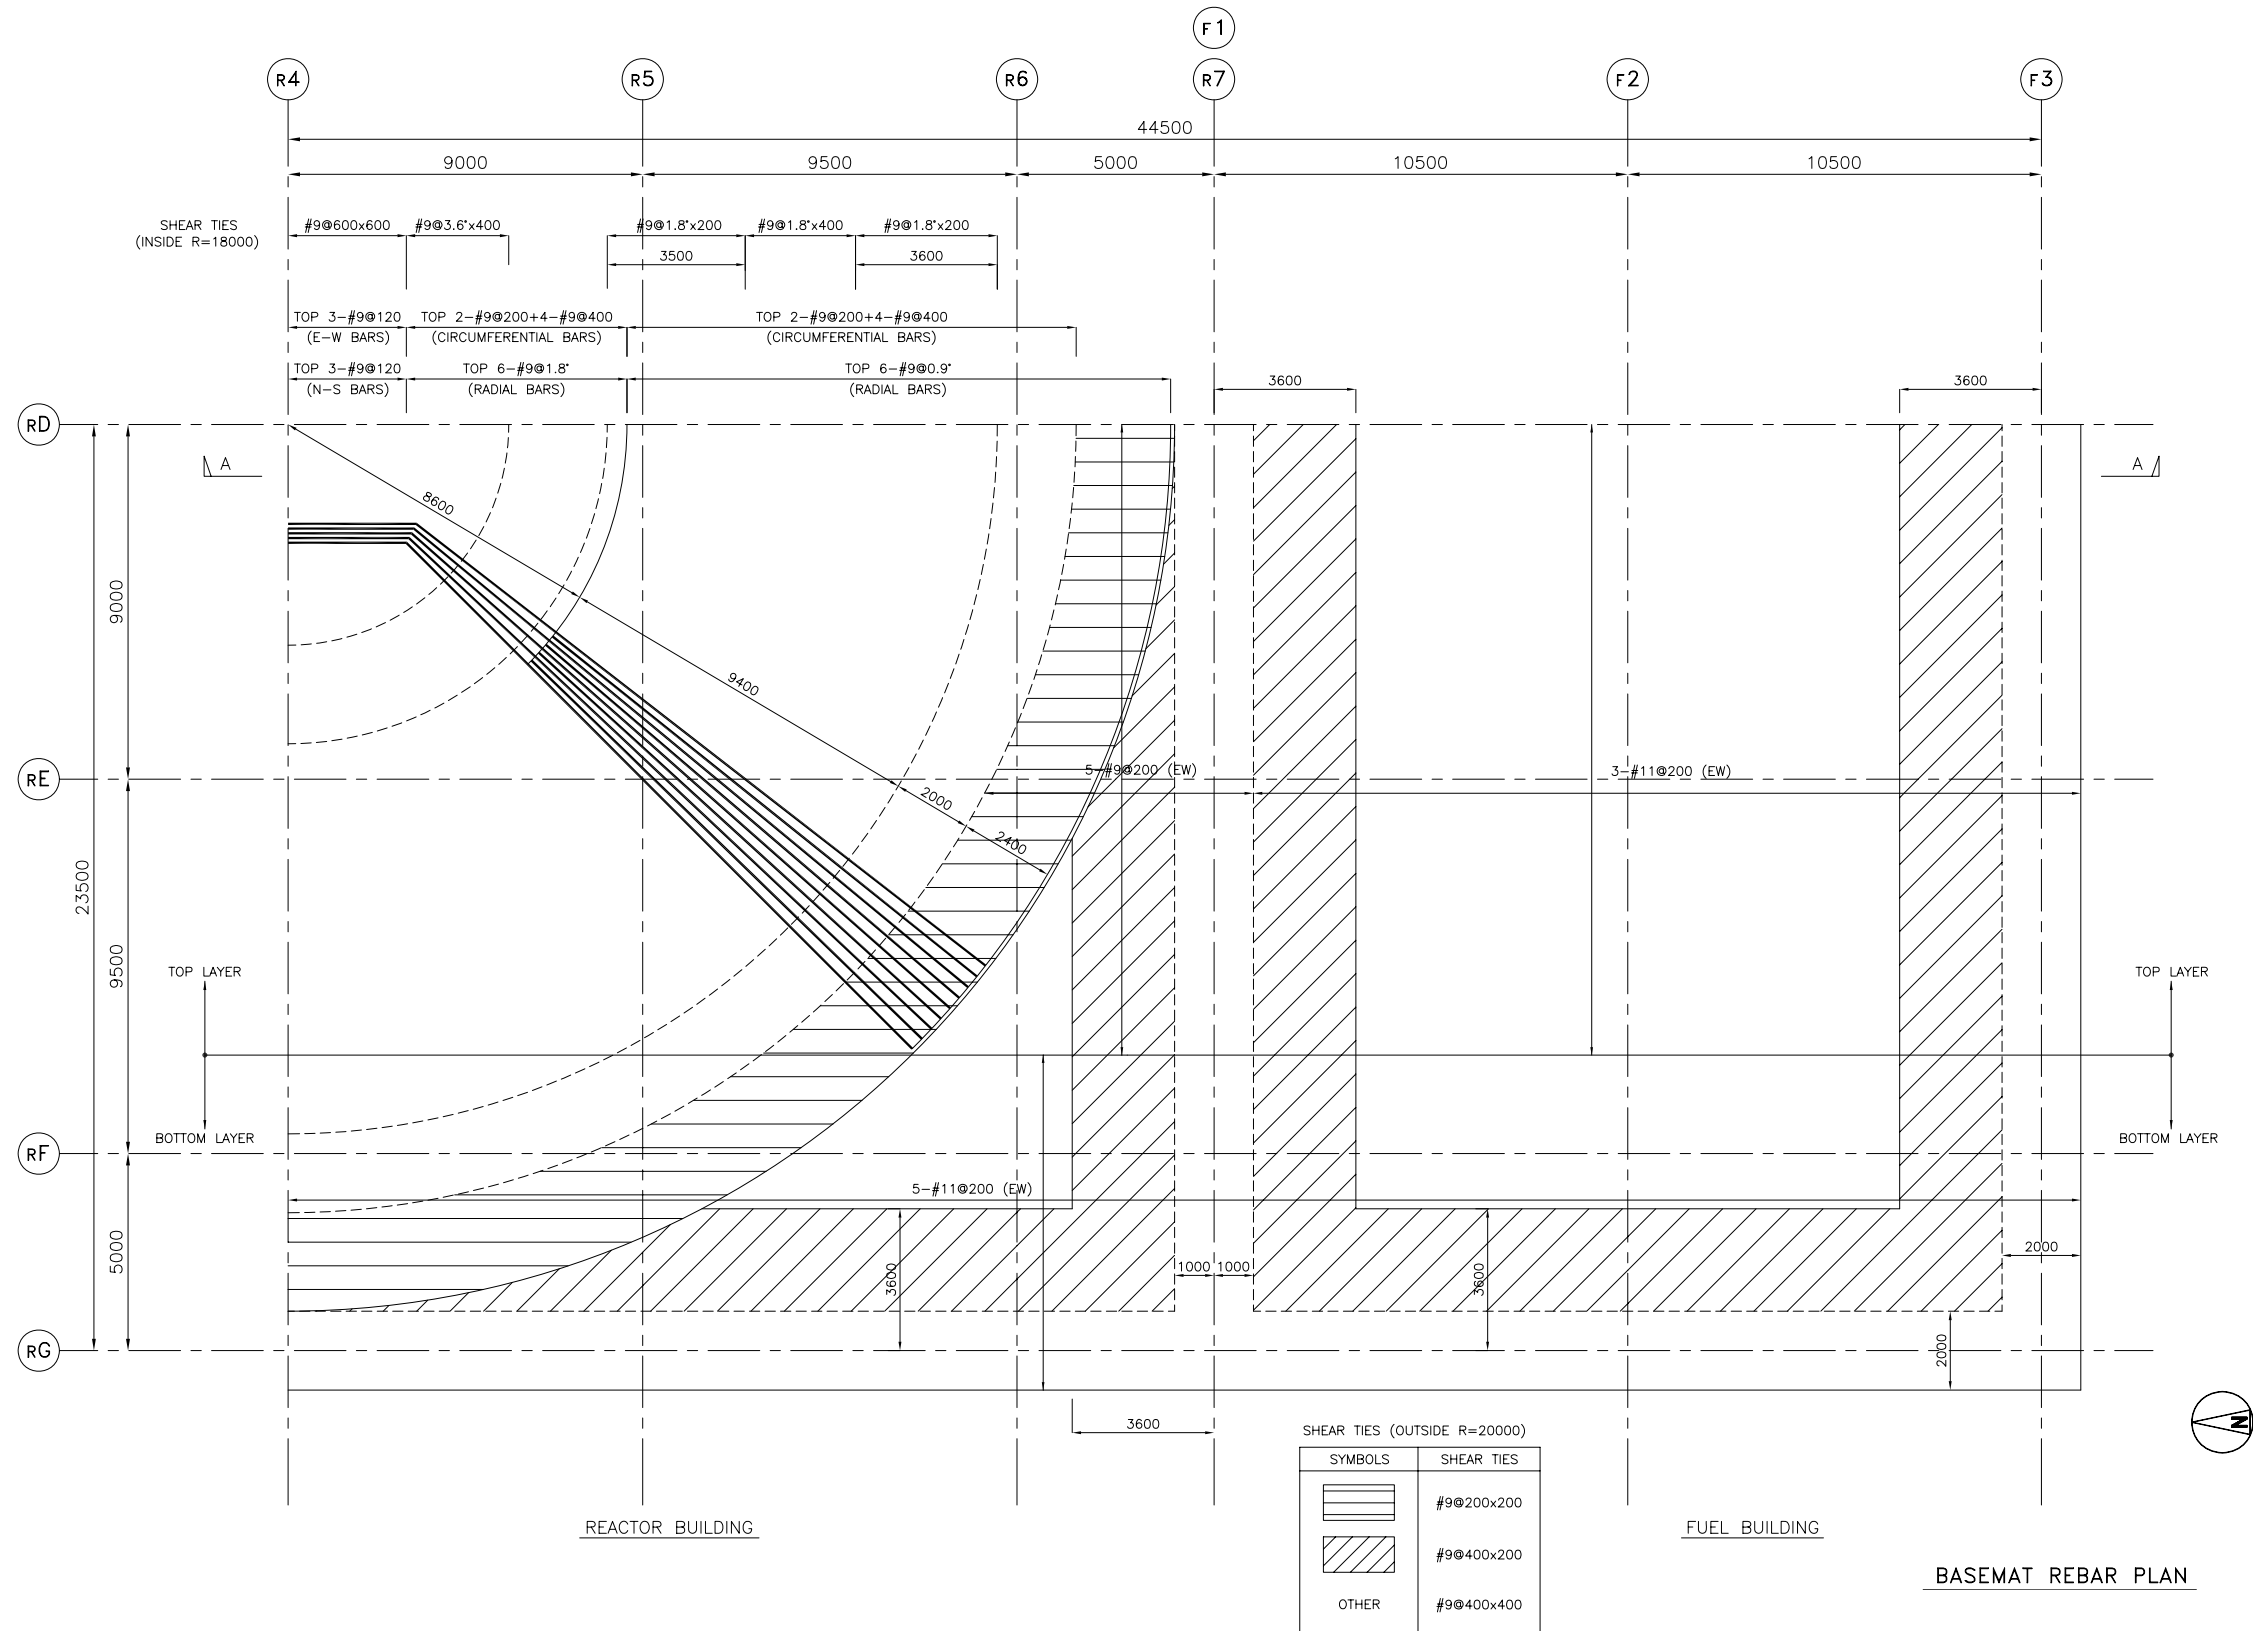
G.1-40. Reinforcing Steel of Foundation Mat: Plan
